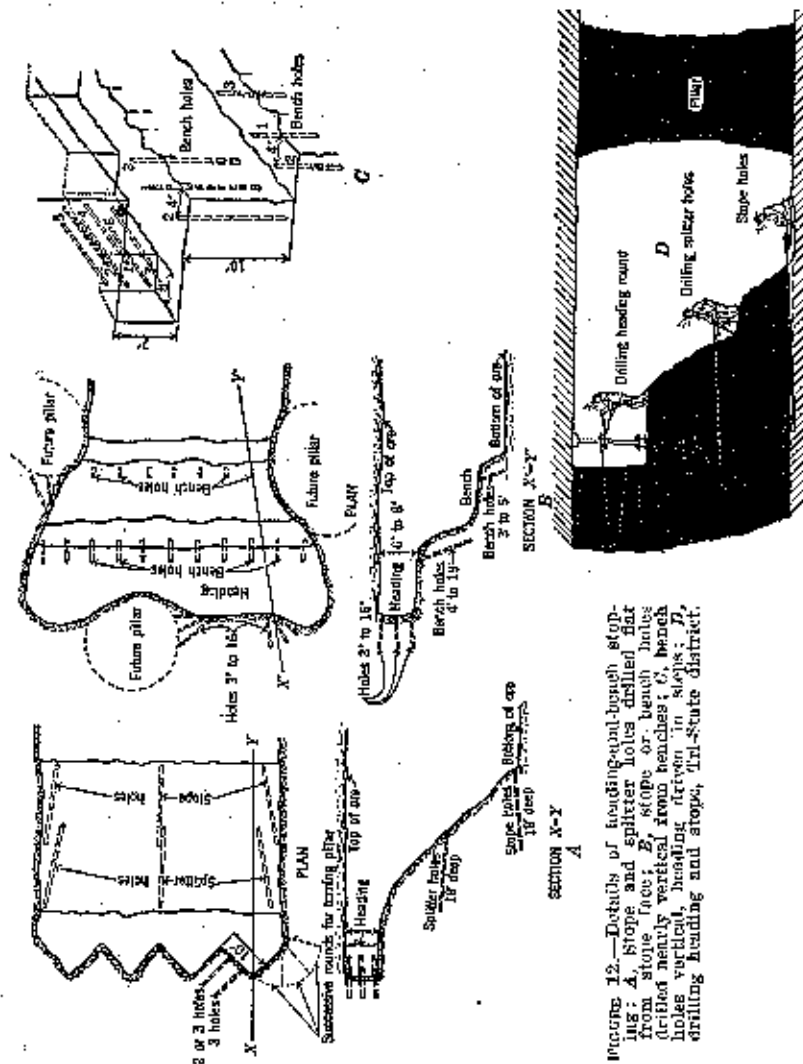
Details of heading-and-bench stoping: A, Slope and splitter holes drilled flat from slope face; B, slope or bench holes drilled nearly vertical from benches; C, bench holes vertical, heading driven in slope; D, drilling heading and slope, Tri-State district.
